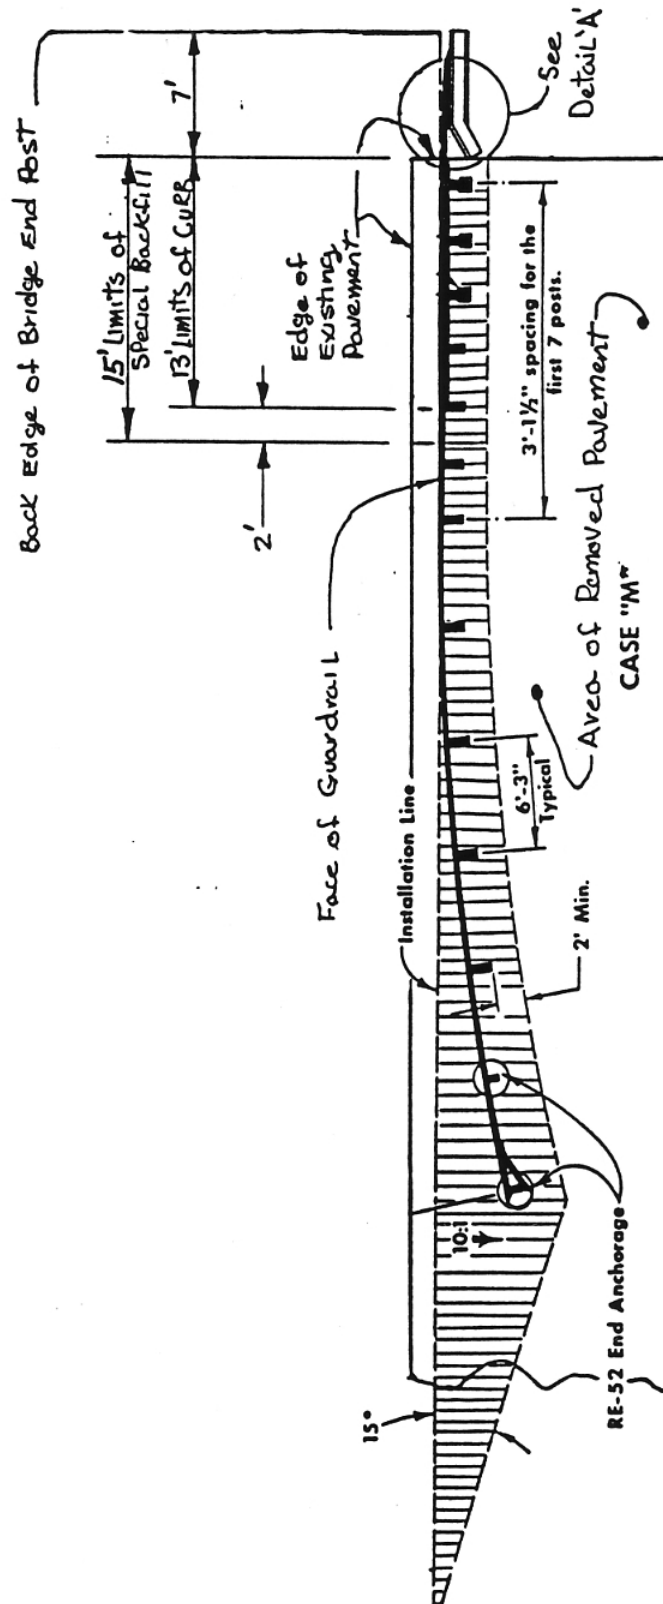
SKETCH OF GUARDRAIL INSTALLATION BRIDGE APPROACH.
